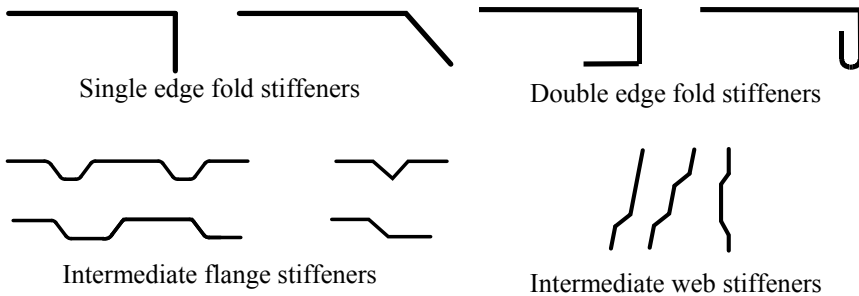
Typical forms of stiffeners for cold-formed members and sheeting
